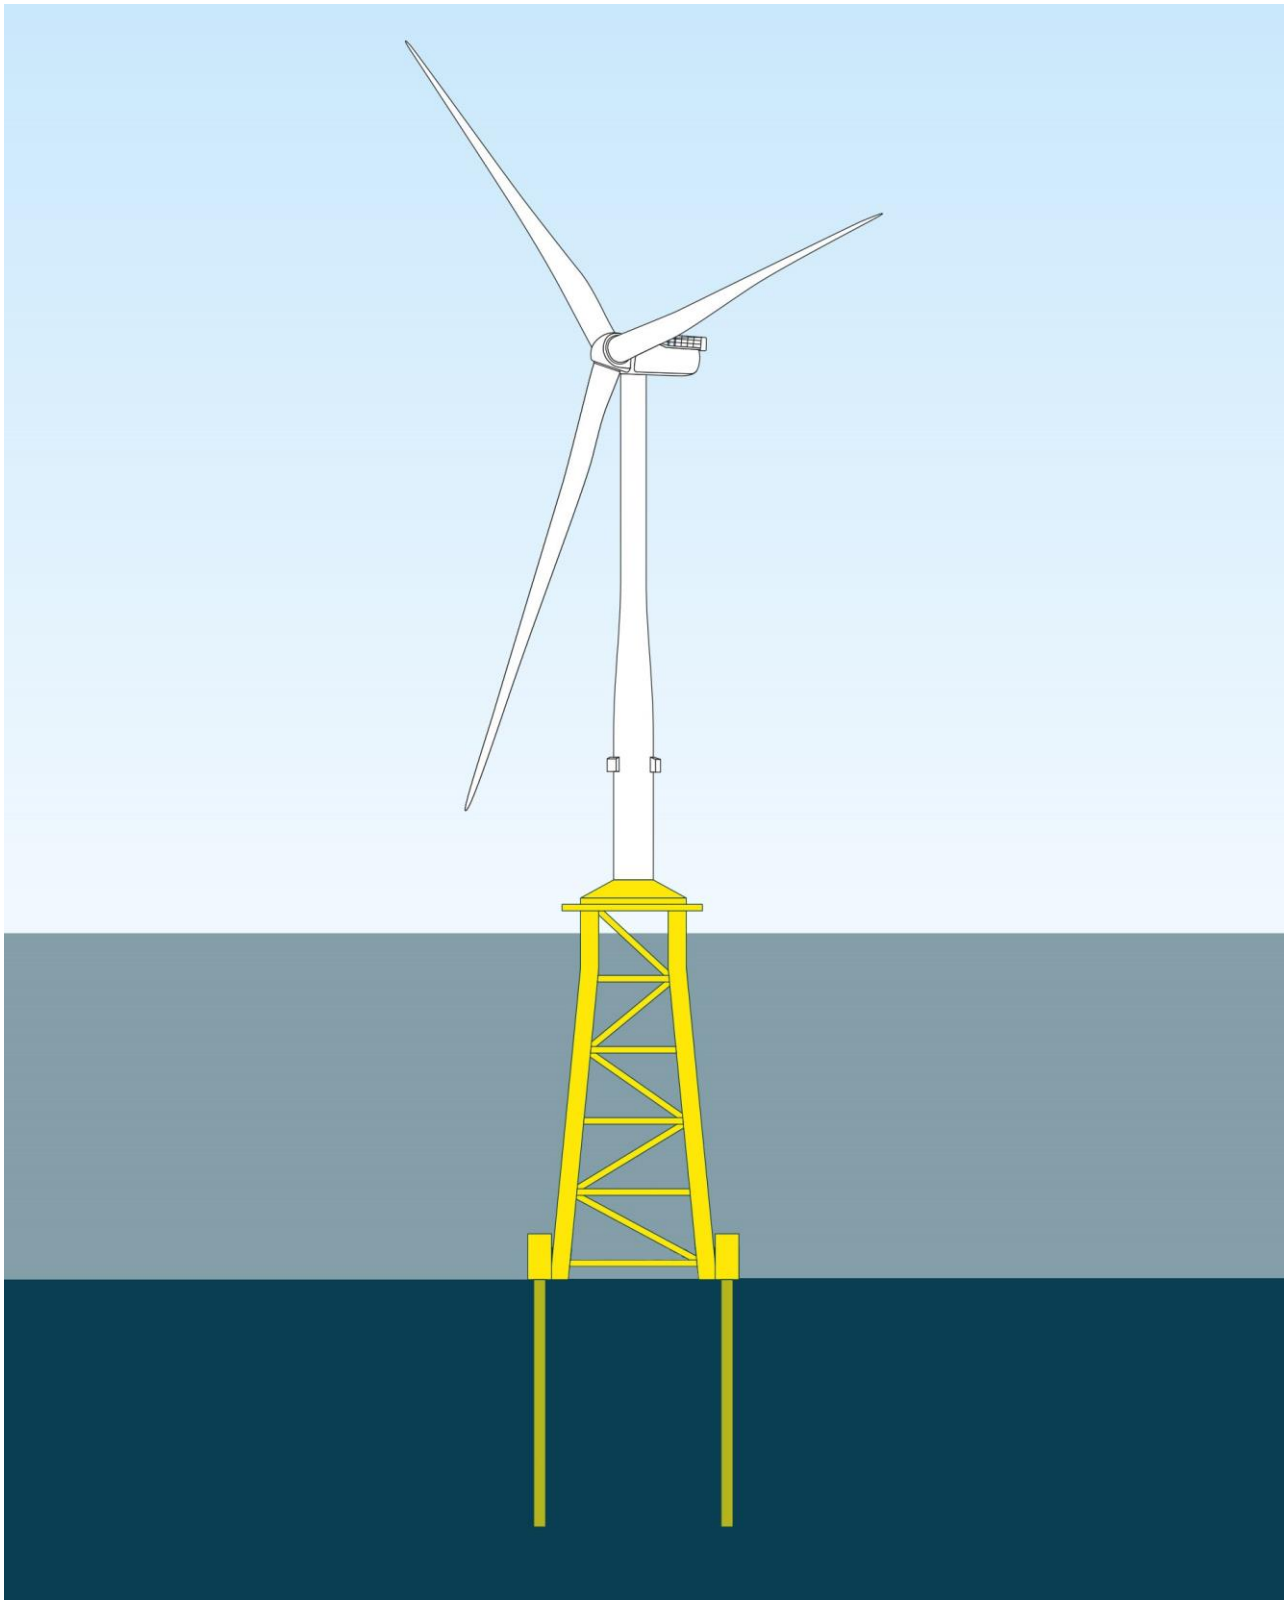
Indicative design of a jacket with pin piles WTG foundation.
